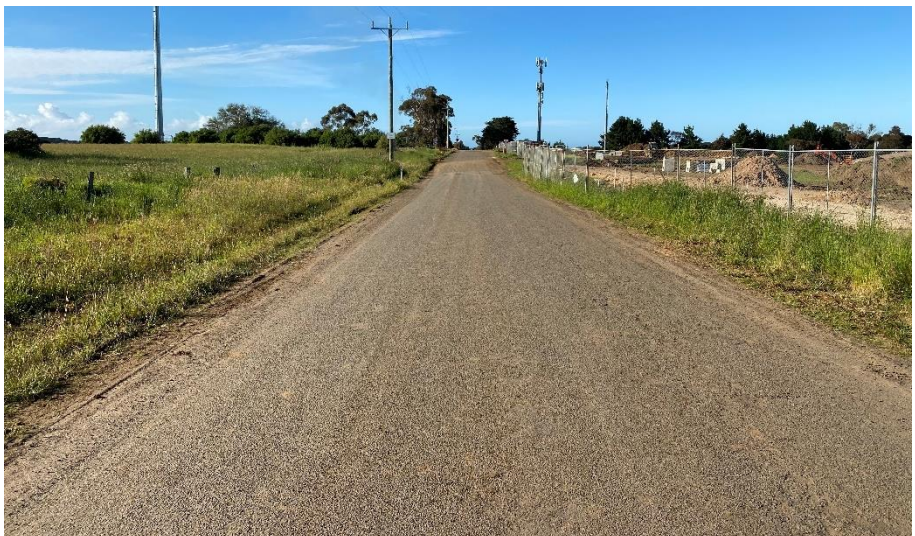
Melaluka Road – looking north towards Warrawee Road
